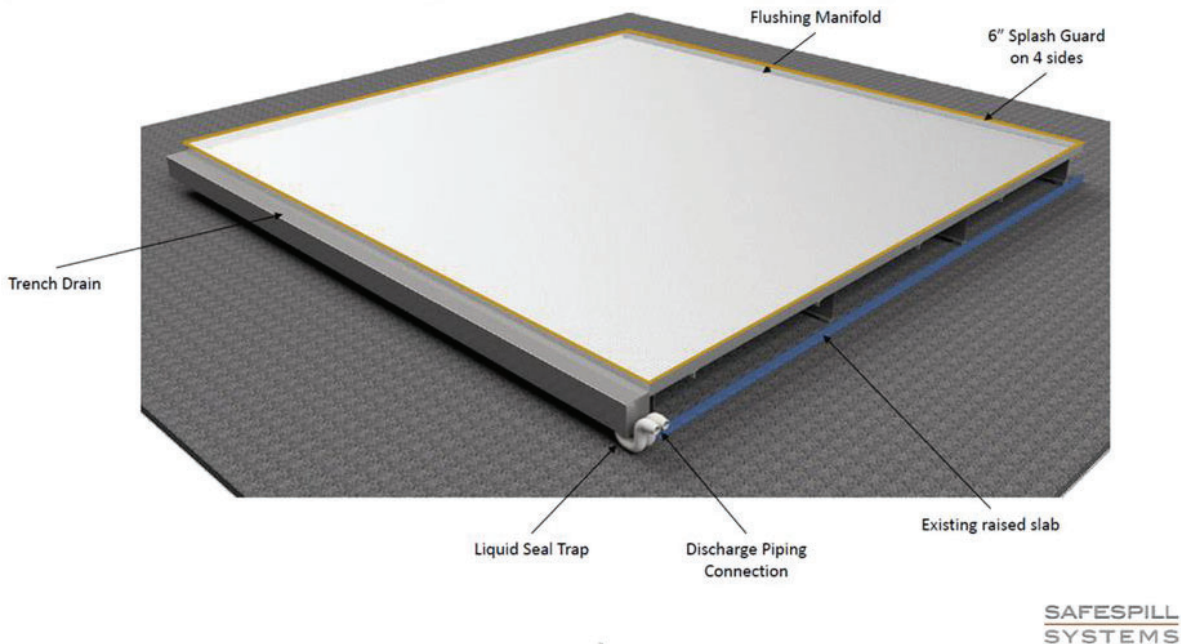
Artist Rendering of Safespill ILDFA Drainage Deck
